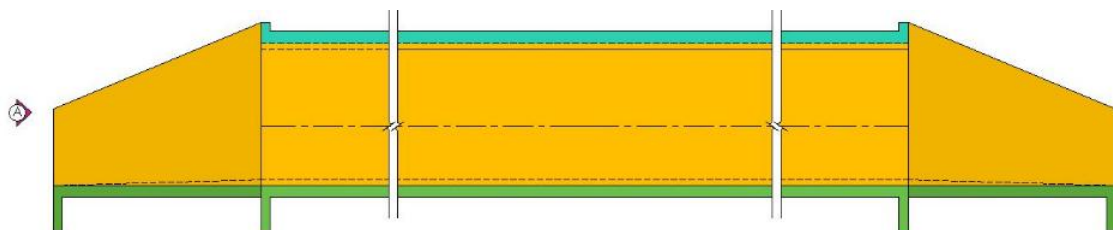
Reinforced Concrete Box Underpass type
